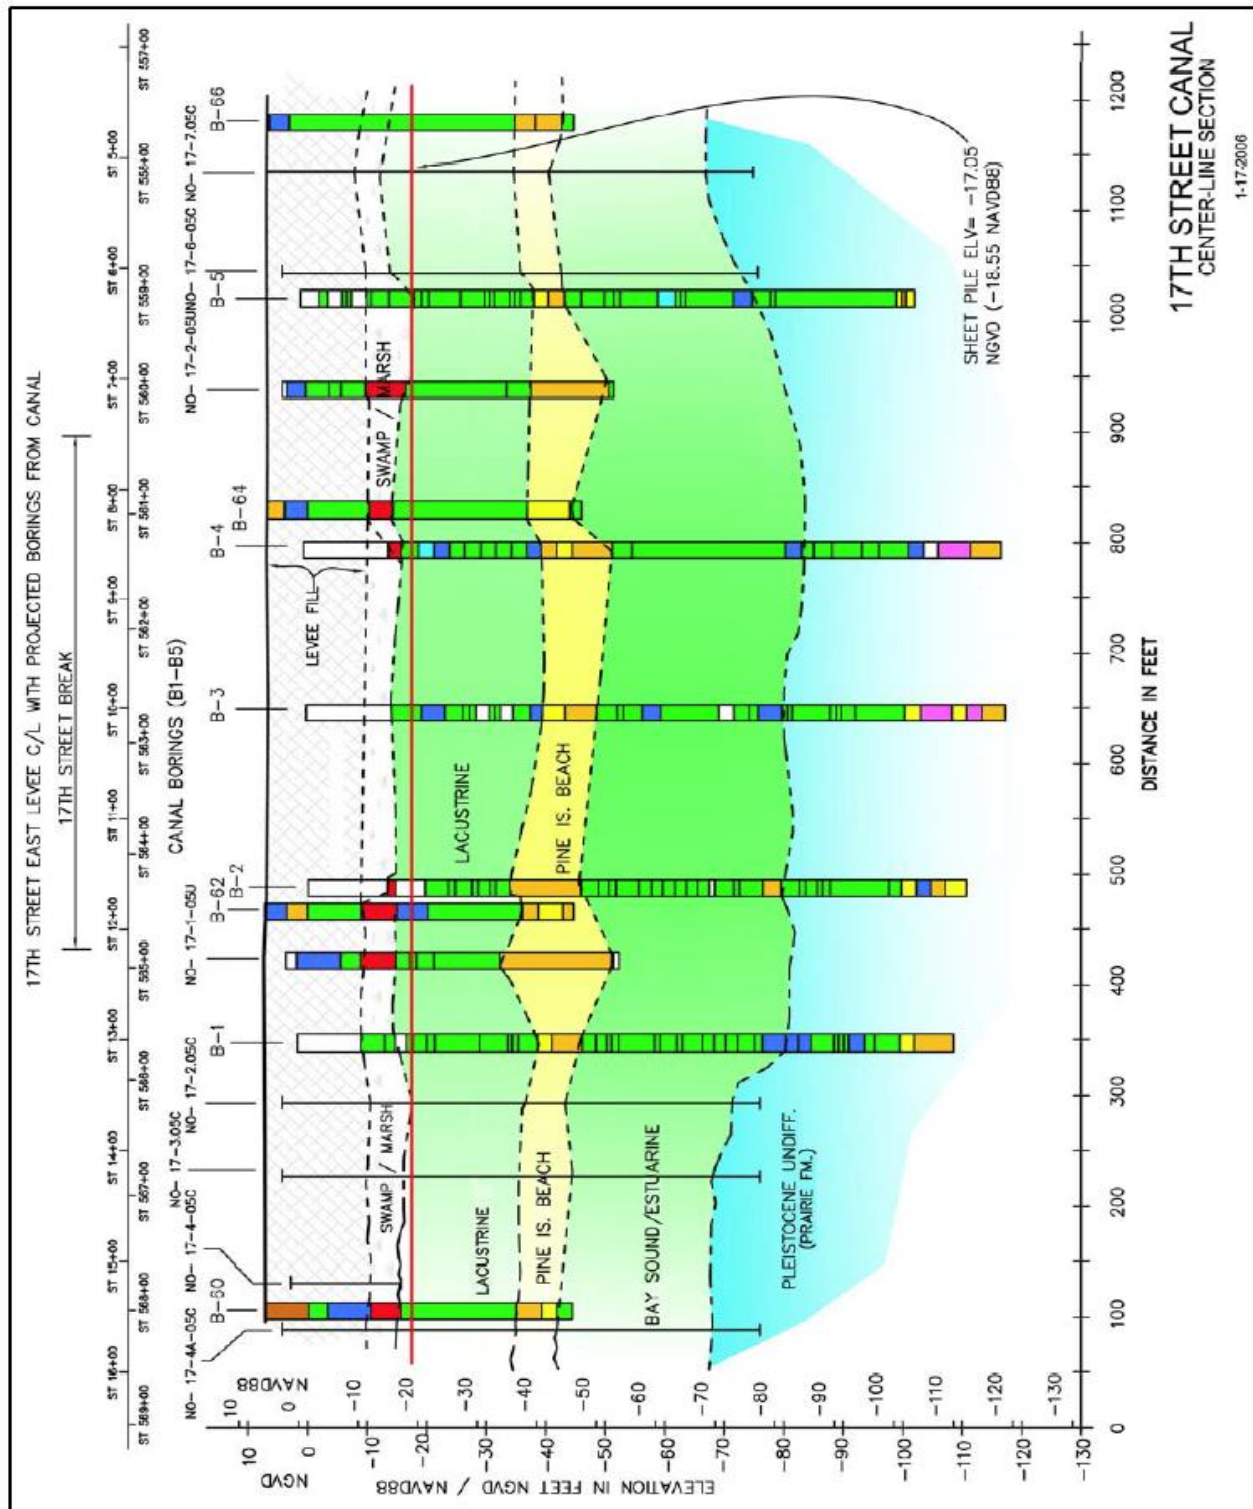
Centerline longitudinal section of 17th Street Canal breach (IPET 2006)
